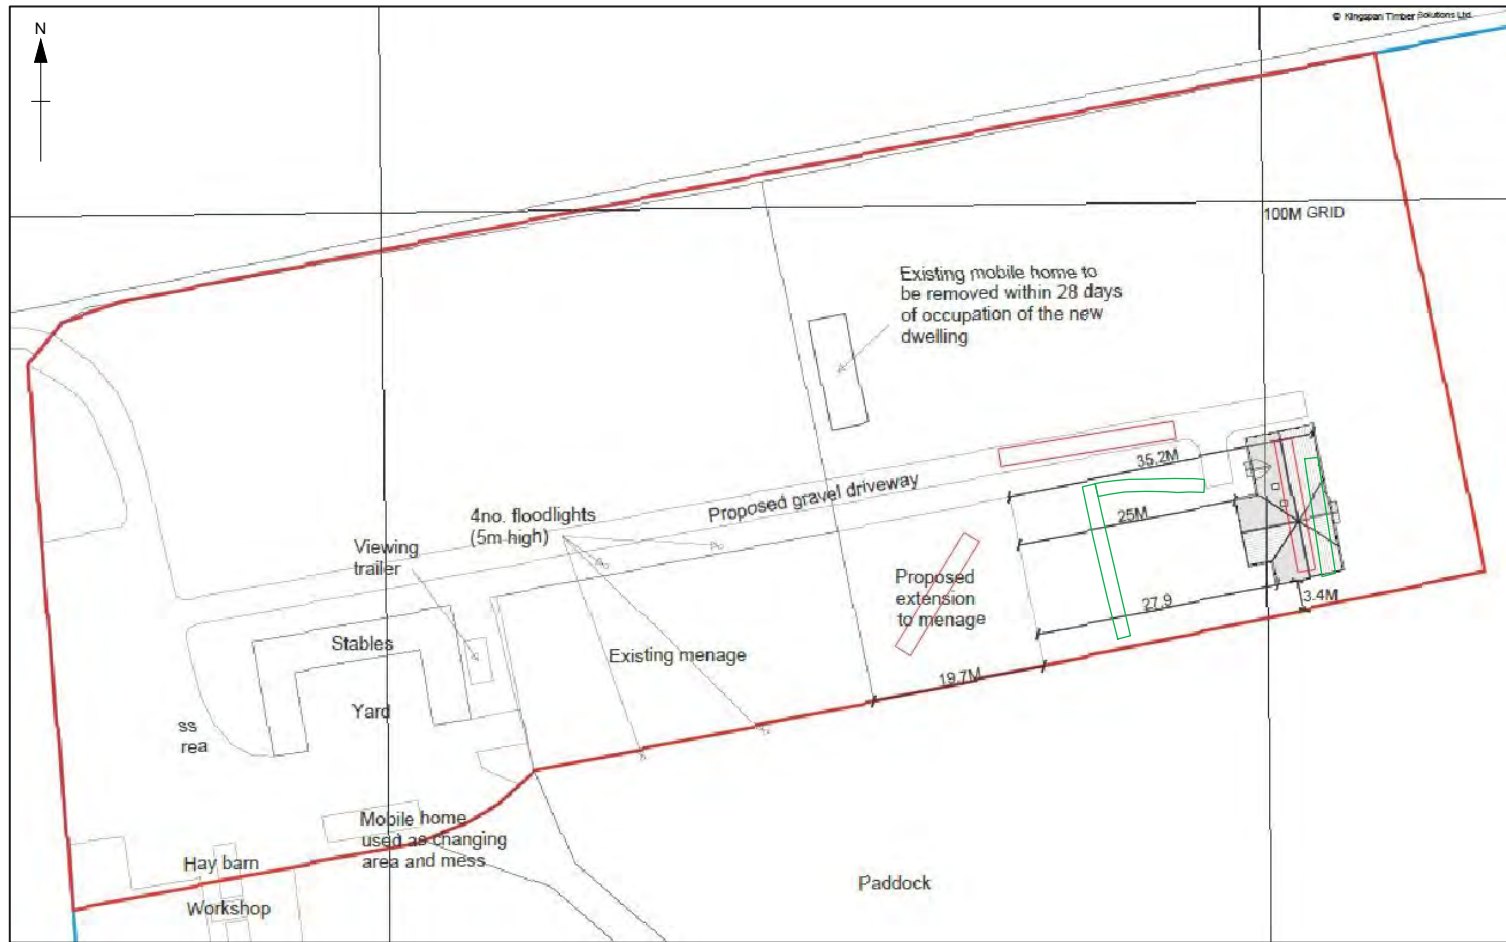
Proposed development plan, showing original trench layout (red) and final trench layout (green)
